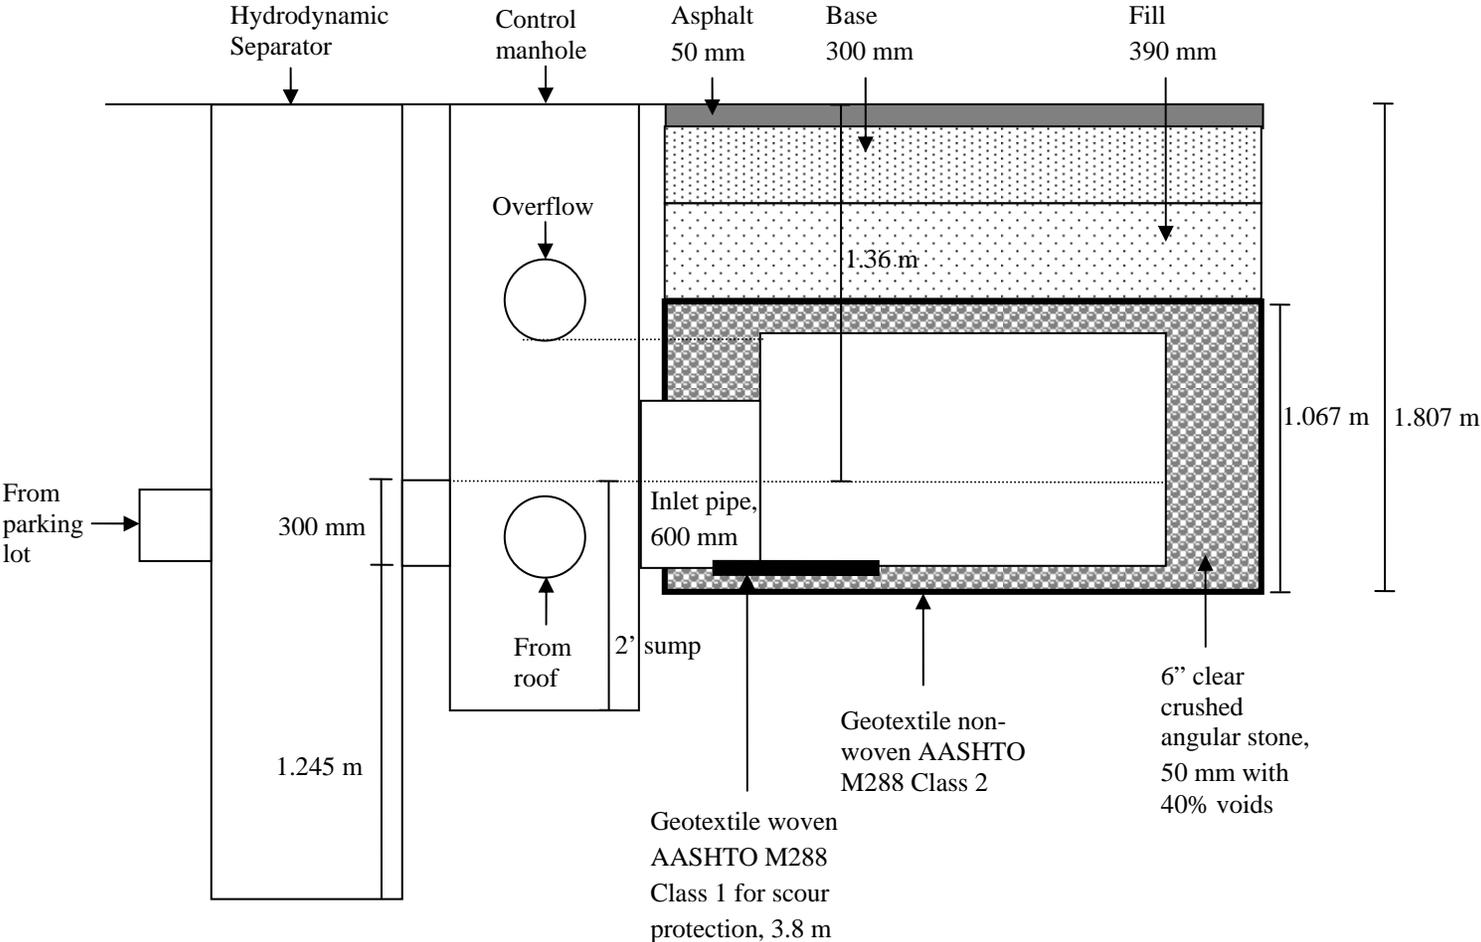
Cross section of infiltration chambers receiving road (1500 m²) and roof runoff (500 m²)
